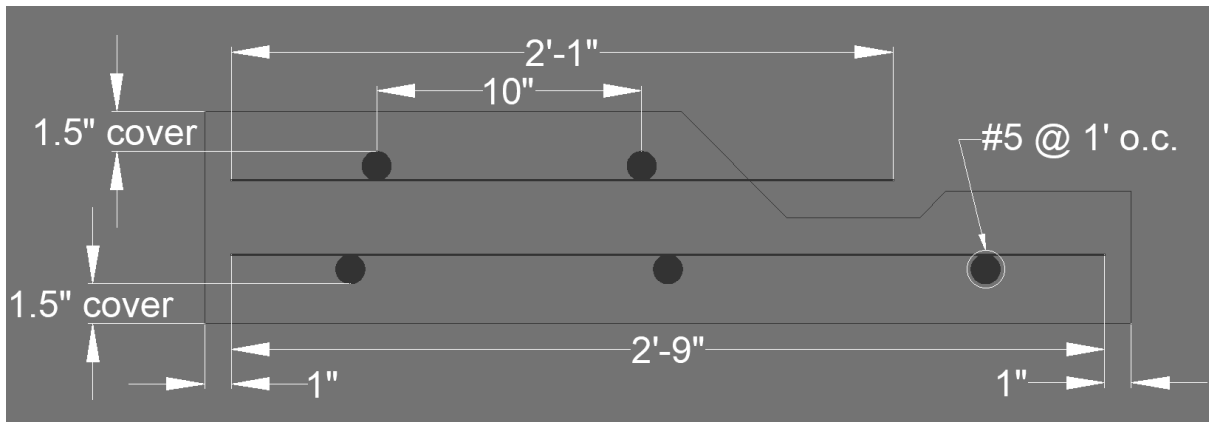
B-B' elevation of specimen design from Figure 3-3
